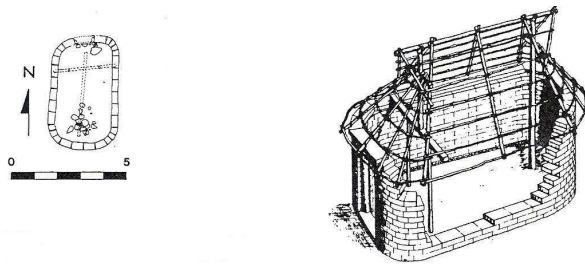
Plan and graphic restoration of oval house of c. 900 BC in Trench H at Old Smyrna.
